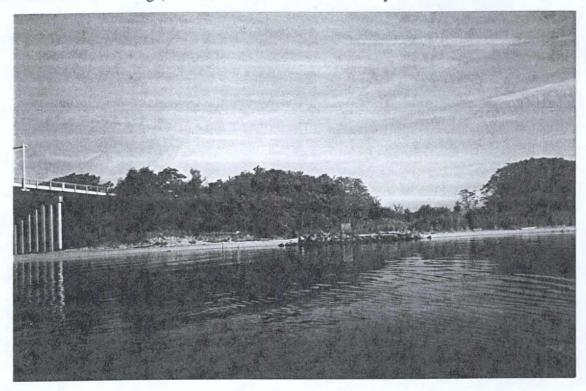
Mill Basin bridge, northern abutment view from basin looking northeast. Photo 6: Mill Basin bridge, northern abutment view from bay toward northwest.
